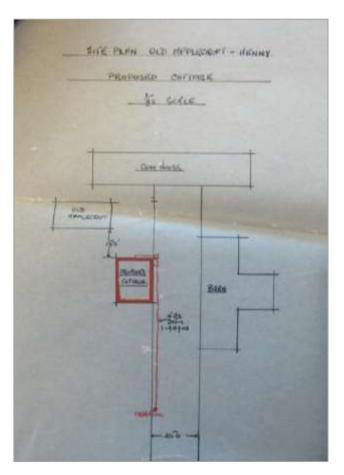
Schematic site plan, 1945 (ERO D/RH Pb1/908)
